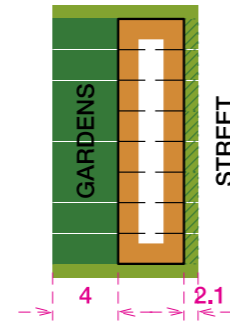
Plan diagram: Ground floor frontages behind Terraced Houses
